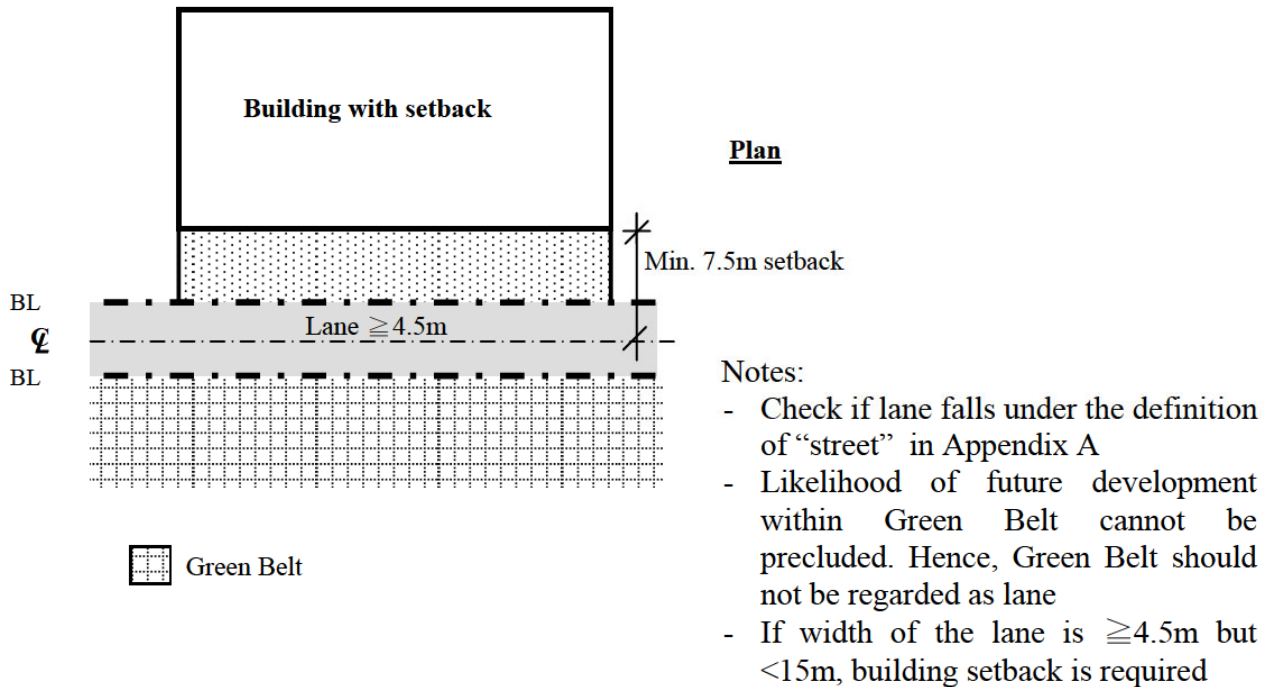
Example (1) of Building Setback - Site abutting narrow lane with Green Belt beyond
